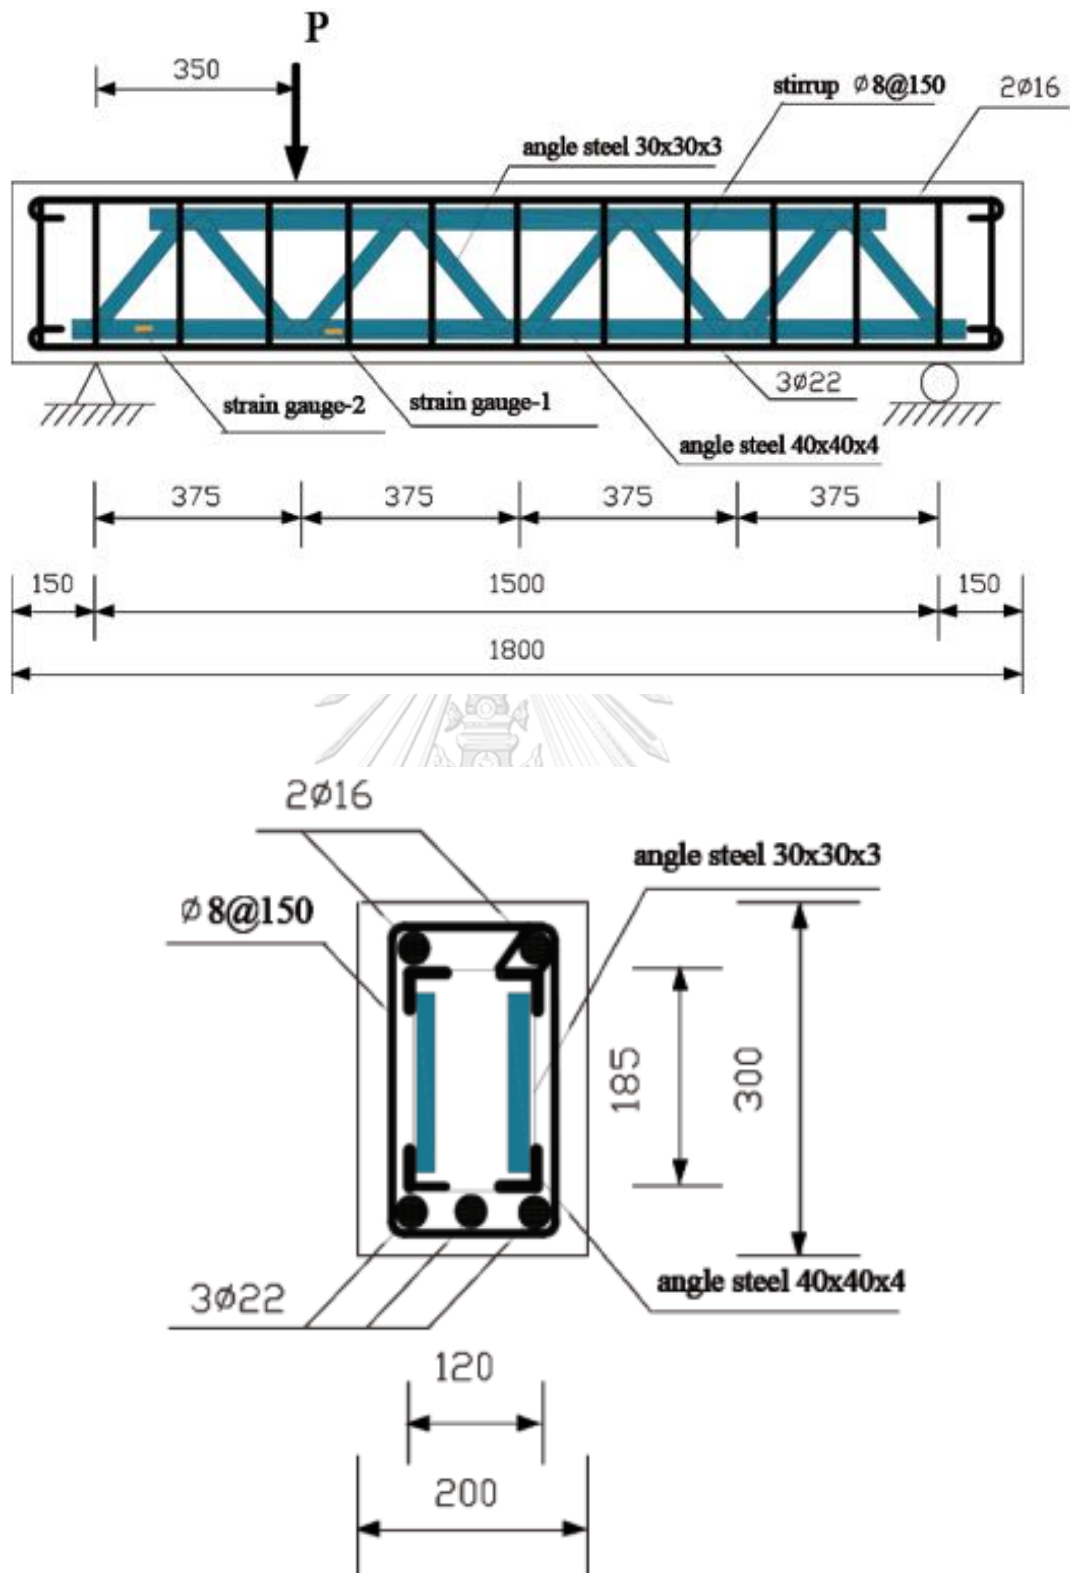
Profile and cross-section detail of SRCB4 (Zhang et al., 2016)
